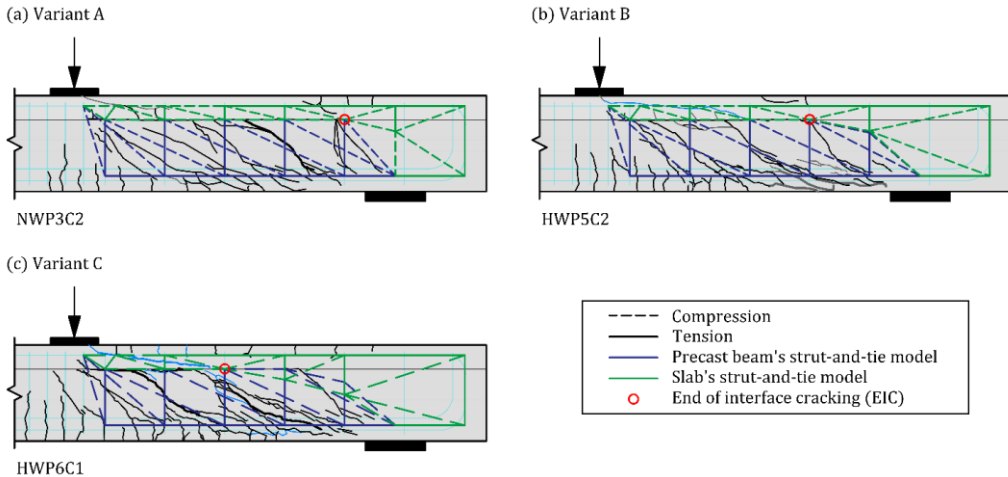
Strut-and-tie model for the precast beam and the cast-in-place slab proposed in [24]: (a) Variant A (specimen NWP3C2); (b) Variant B (specimen HWP5C2); (c) Variant C (specimen HWP6C1).
